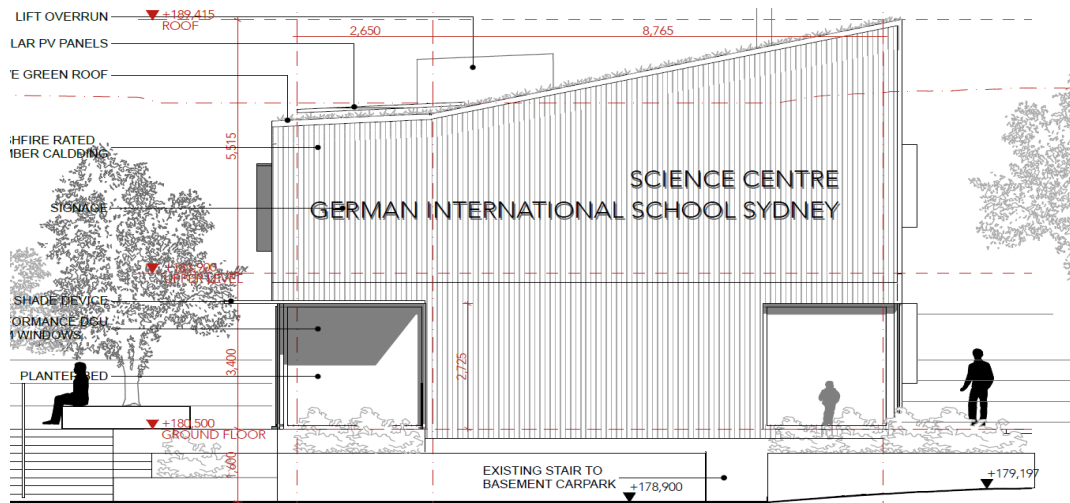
Proposed signage as detailed on the west elevation (Source: Betti&knut architecture)
